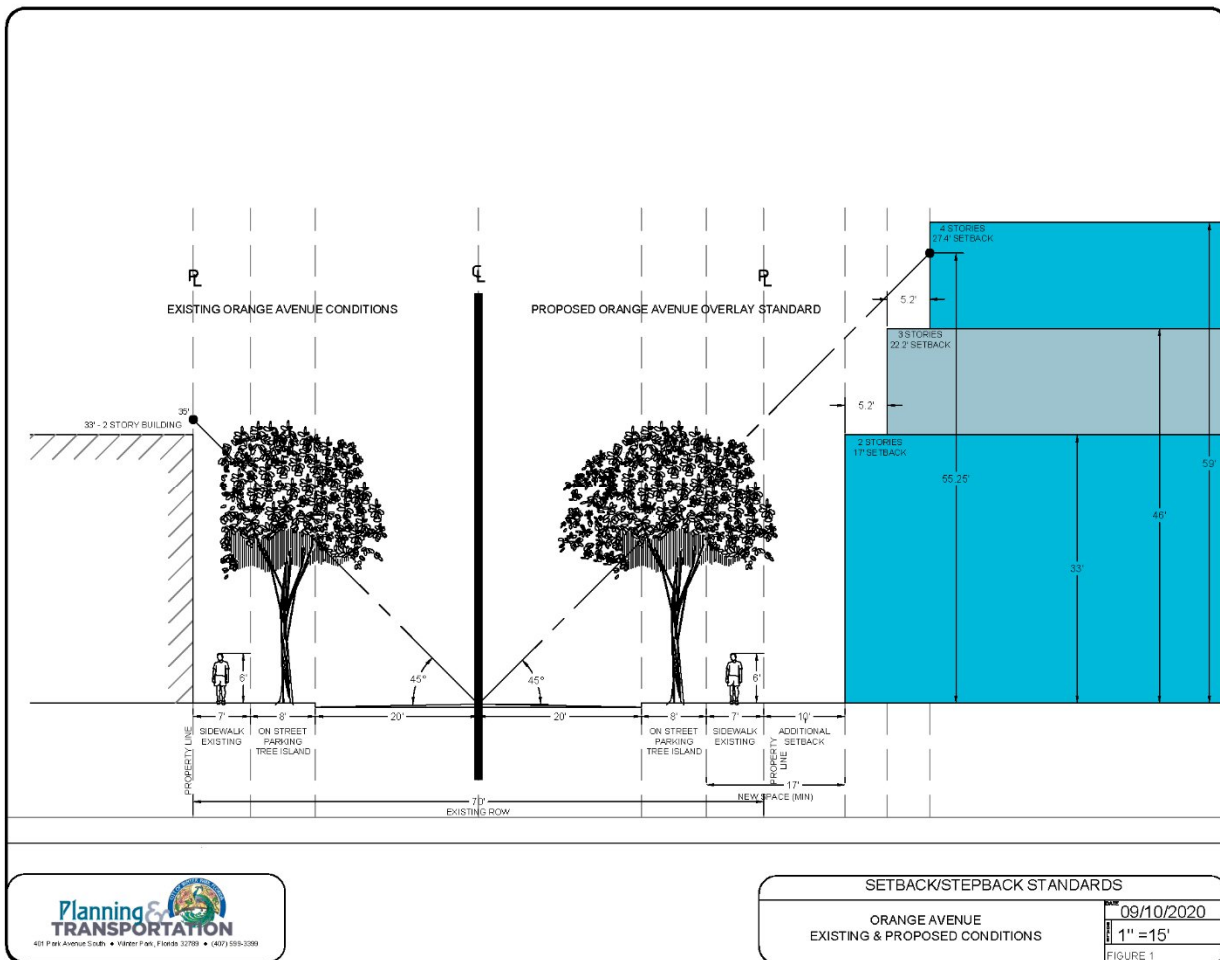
Typical Cross-Section for Orange Avenue Setback/Stepbacks
